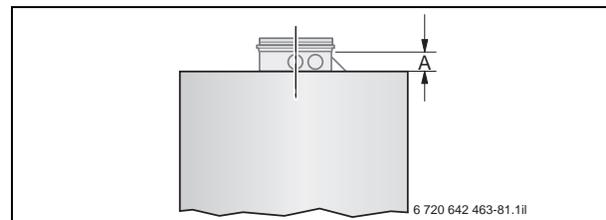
Installation dimensions of the concentric boiler flue connection (dim. A → tab. 62)
